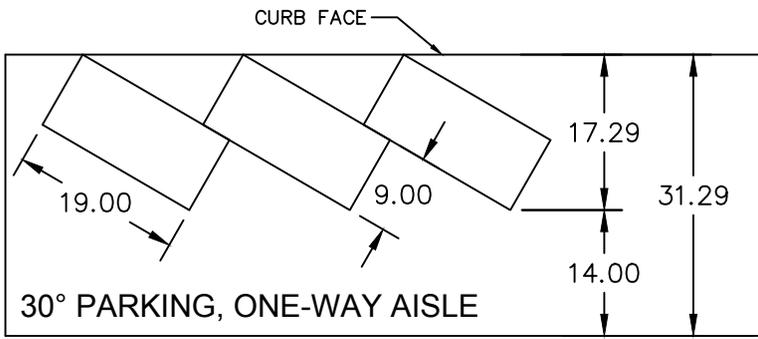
EXHIBIT C – CURRENT 3.24.020(6) EXHIBIT, Parking Lot Dimensions and Size of Parking Spaces
